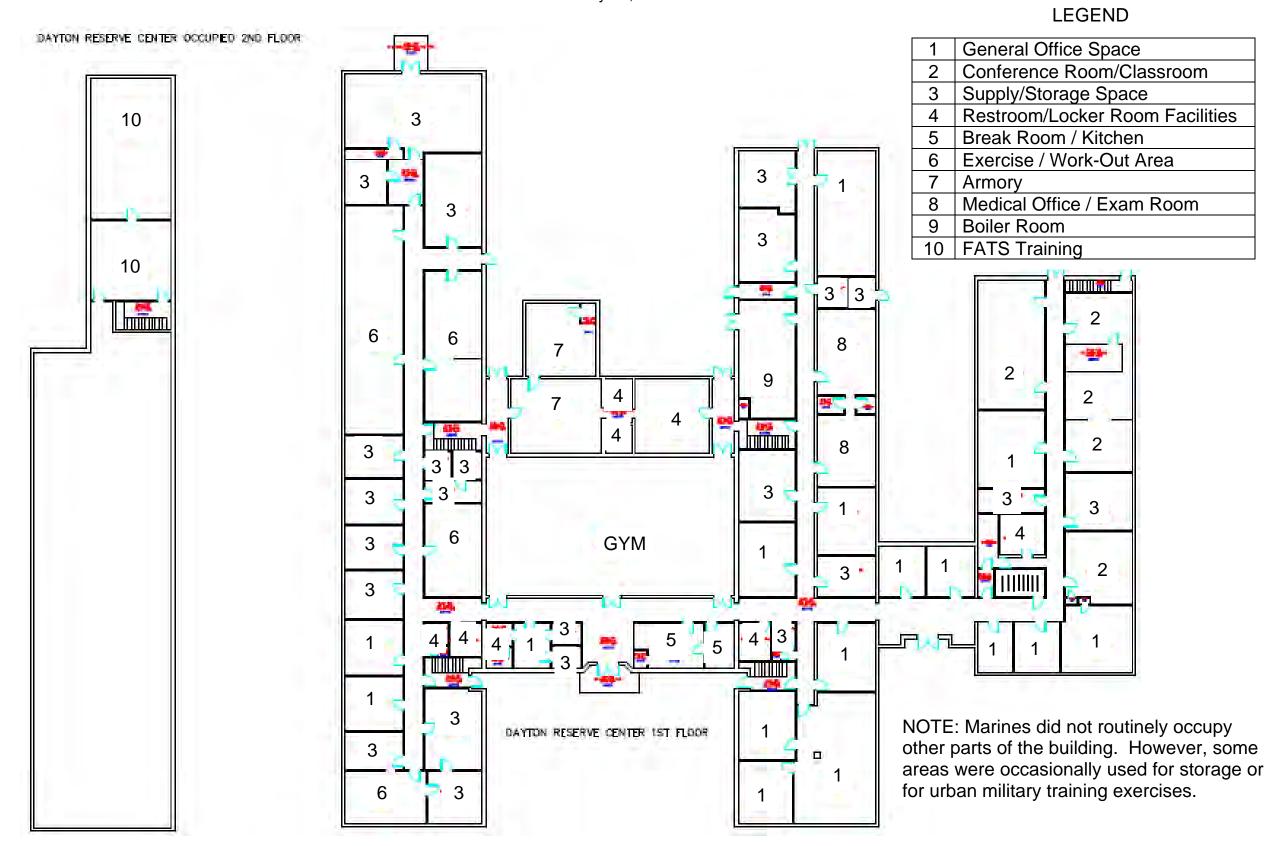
Floor Plan of Main Building at MCRC Dayton (not to scale)
